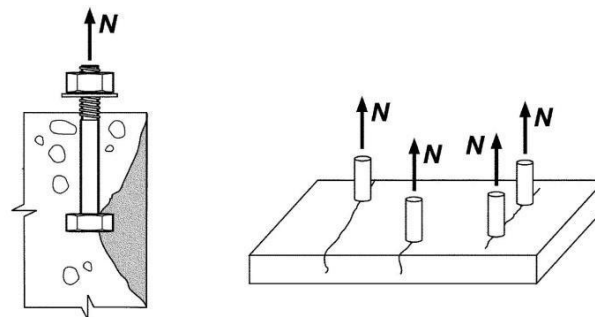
Tensile Failure Type iv) Side-face blowout, v) Concrete Splitting
